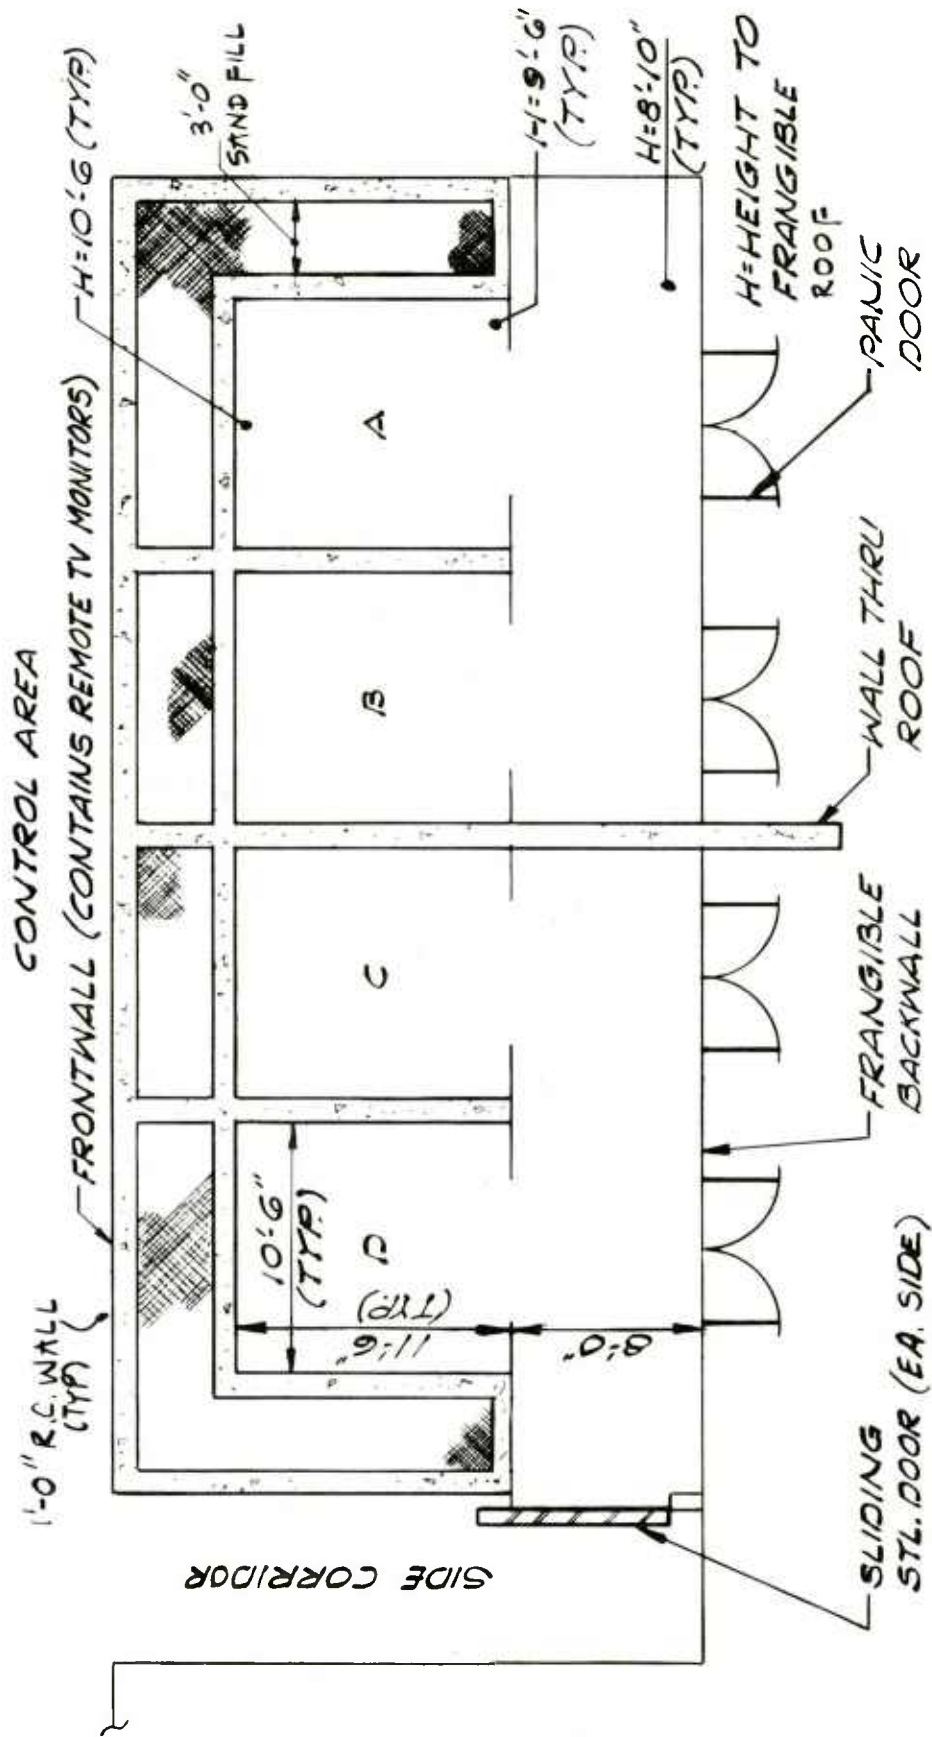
Plan of bays, Buildings 7 through 16, Longhorn AAP
